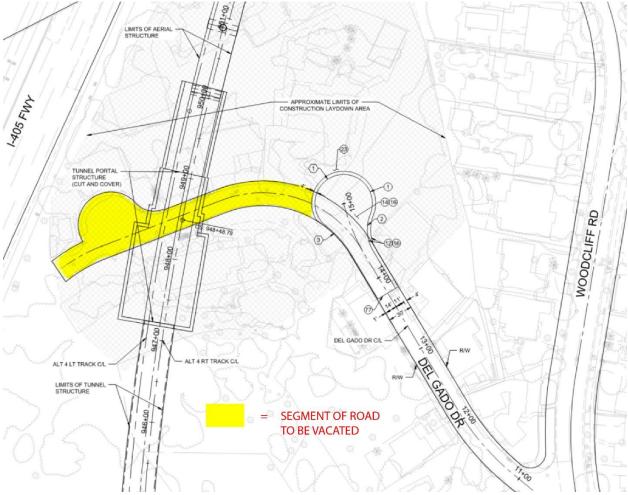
Alternative 4: Street Vacation at Del Gado Drive
